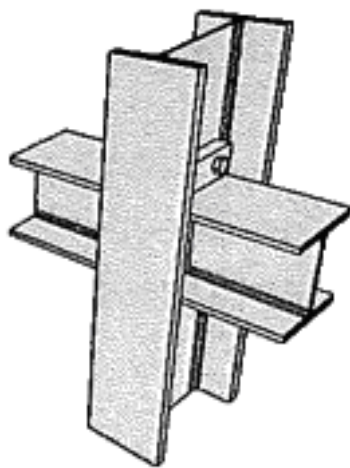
Bolted hot rolled steel beams, adopted from SBI (1988).
